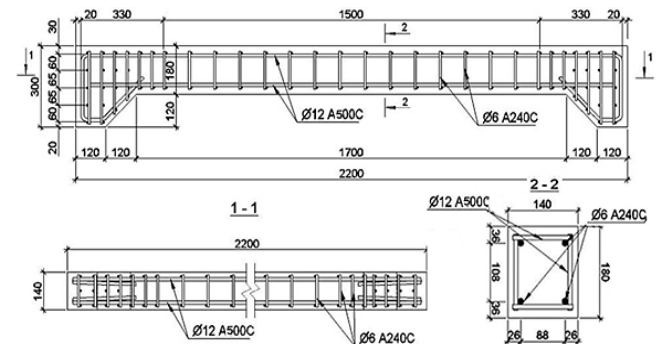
The formwork dimensions of the unstrengthened samples and their reinforcement scheme
